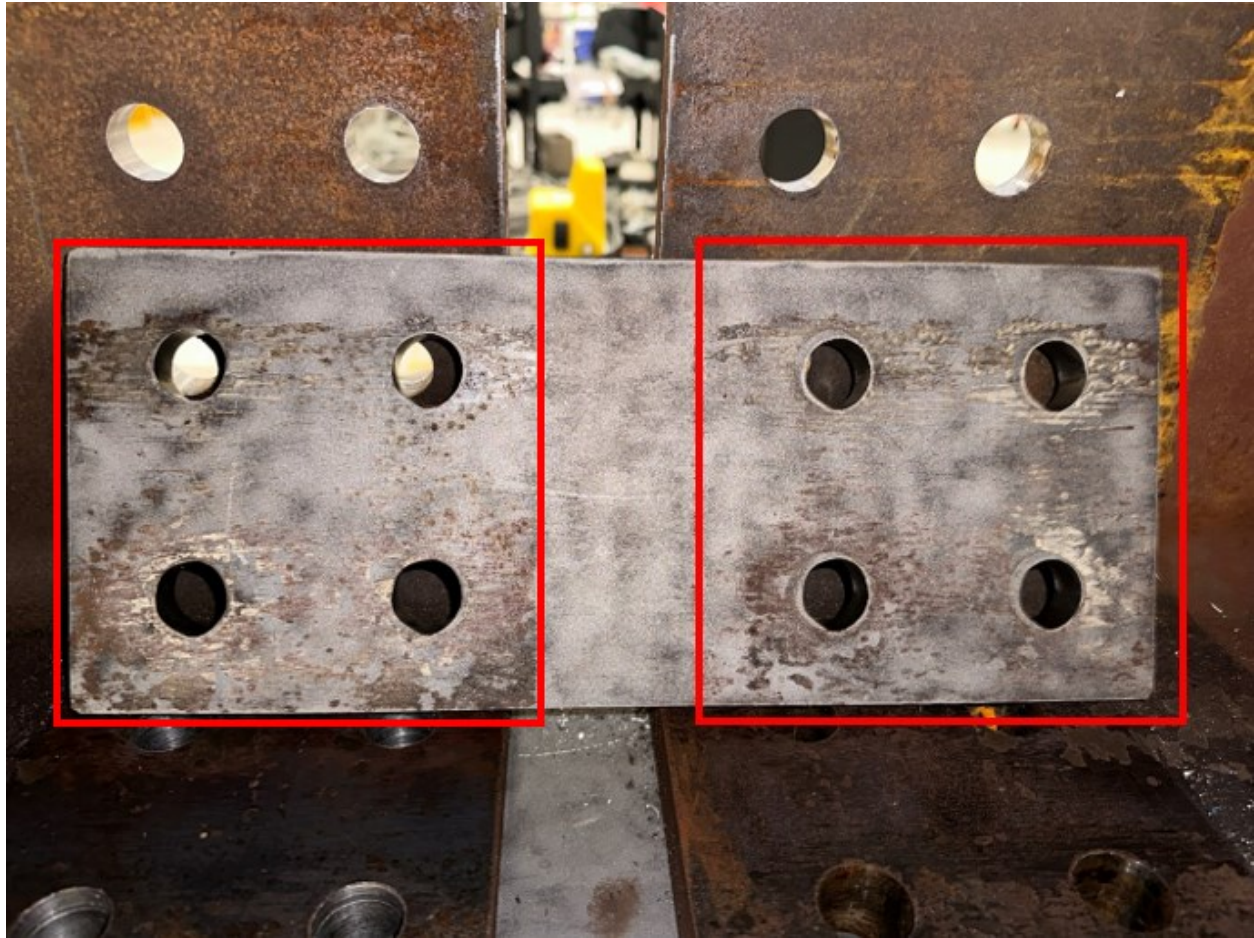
Concept A Bottom Flange Splice Plate after Testing.
